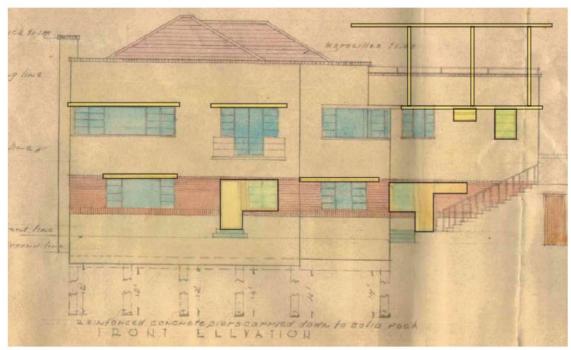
Original drawings showing the main (front) elevation, c. 1938 - Changes to the original front elevation are outlined in black and highlighted in yellow. Source: Woollahra Council
